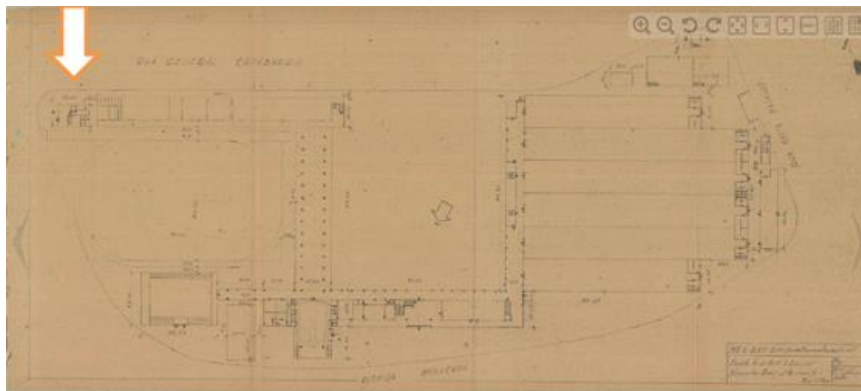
Floor Plan Of The Construction Project Of The Then Future National Technical School, Dated 1934 (Arrow Indicating The Presence Of The Original Block F)¹⁴.
